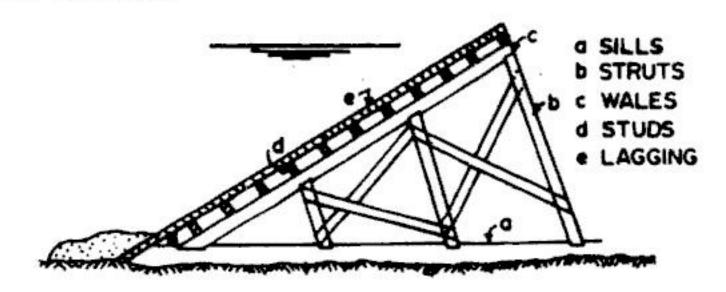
A-FRAME TYPE TIMBER DAM
